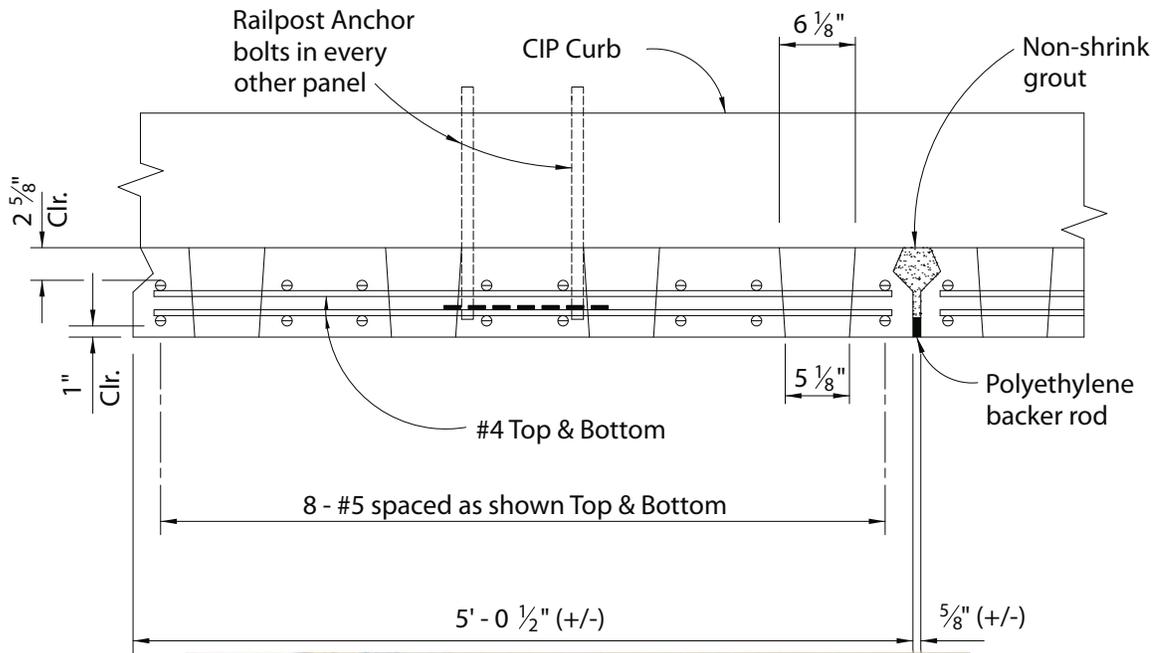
Non-reinforced panel-to-panel connections used on bridges by ADOT.
